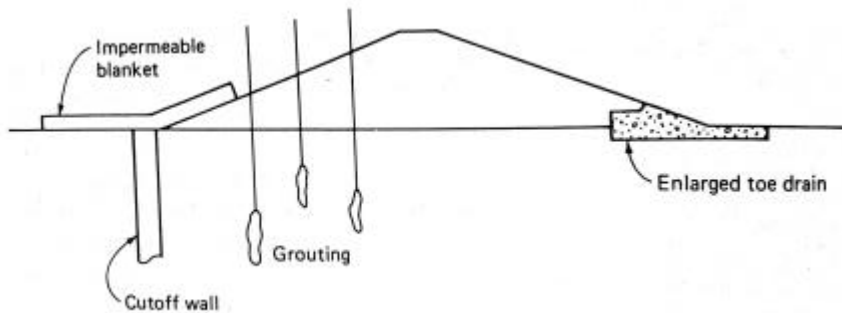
Remedial action for excess seepage through the foundation of an embankment dam:
